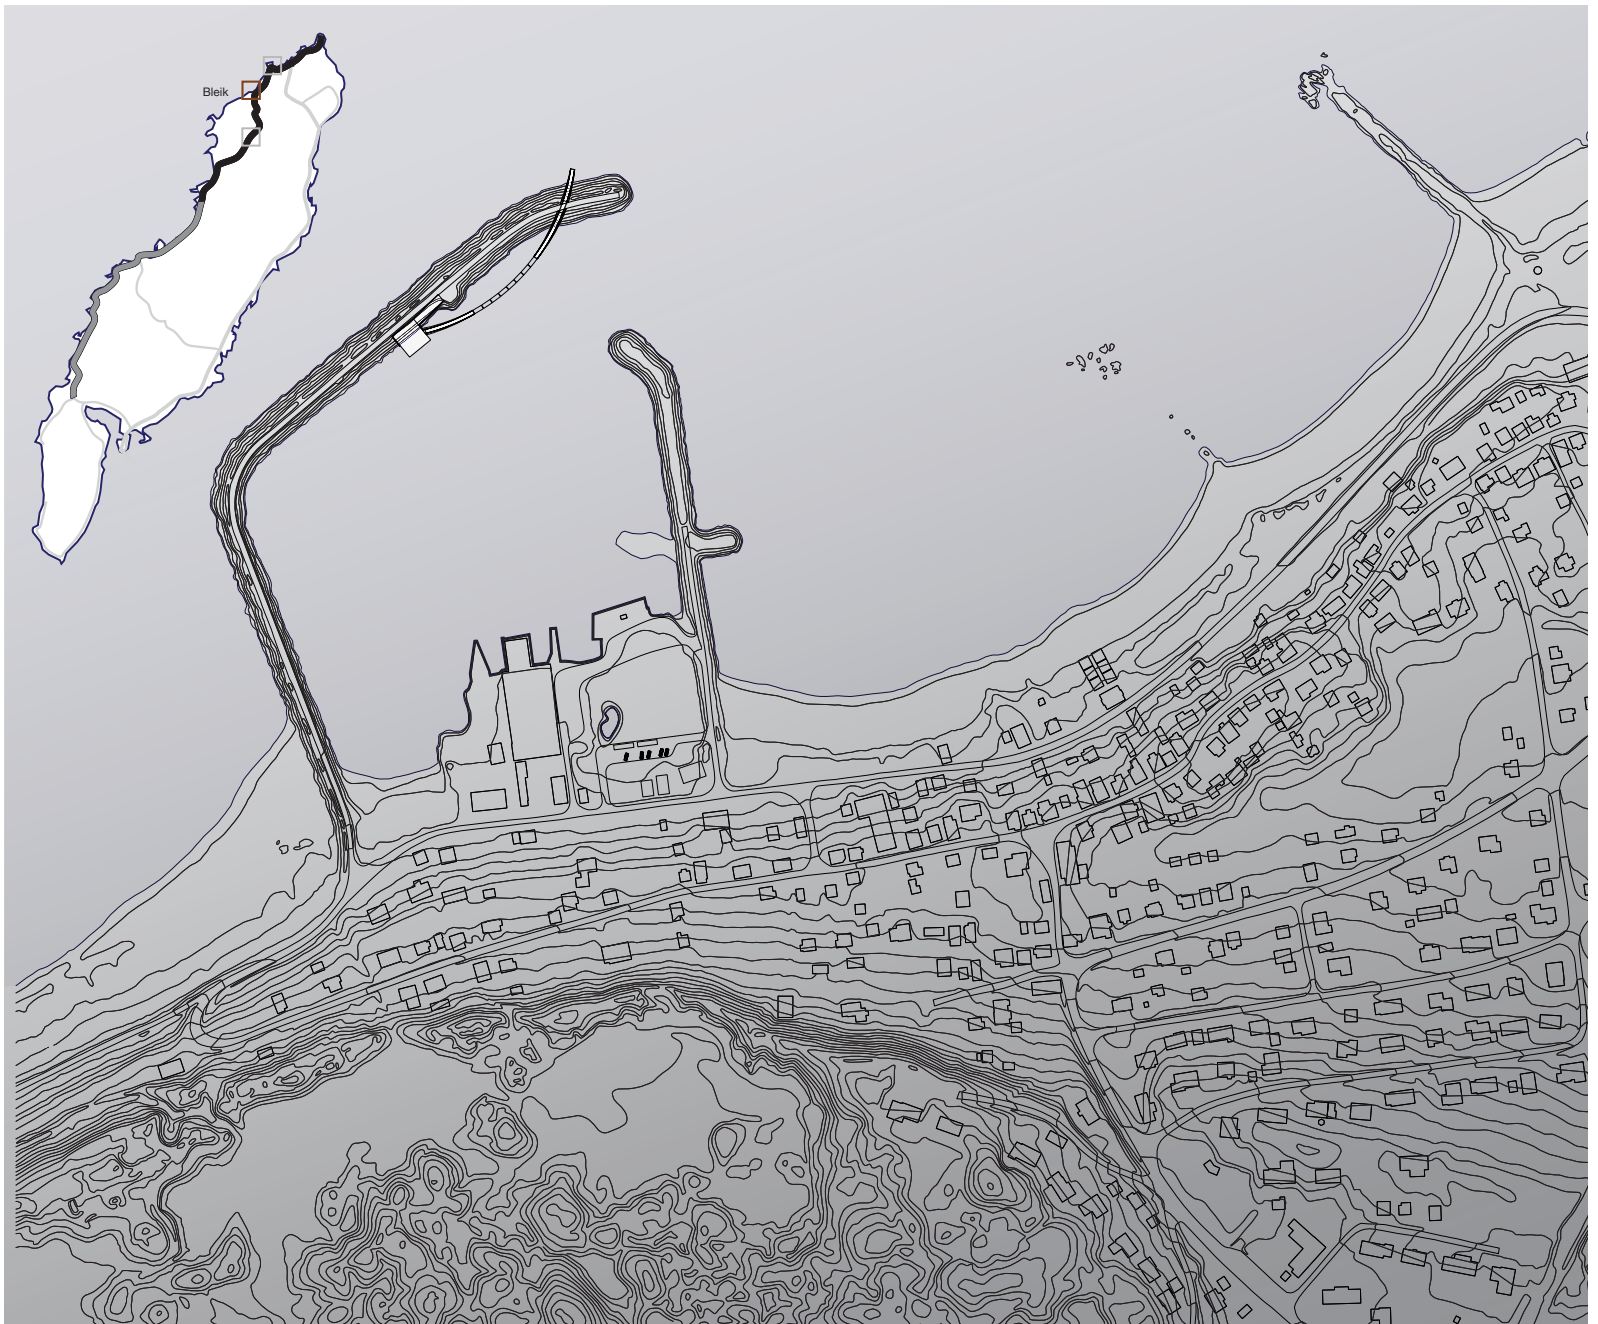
Bleik – Site plan. Inset: Andoya NTR map and site location.
